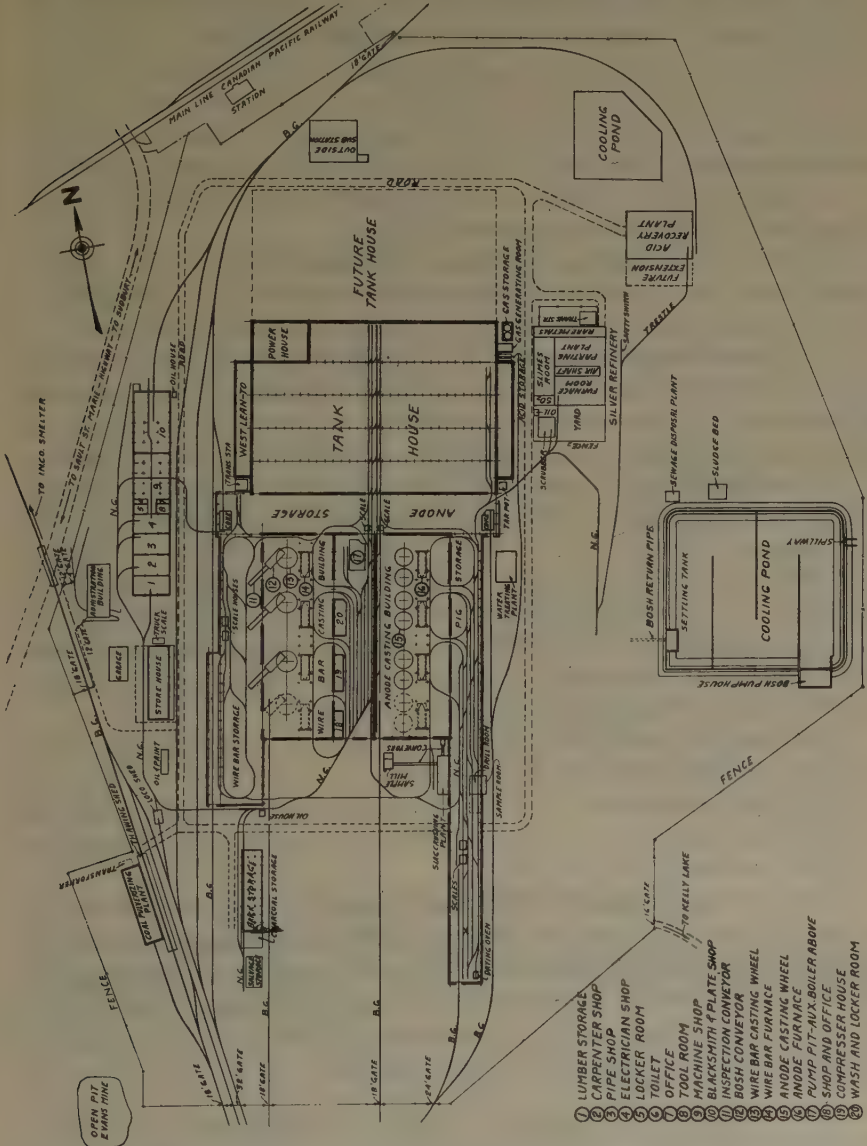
GENERAL PLAN OF ONTARIO REFINERY.
